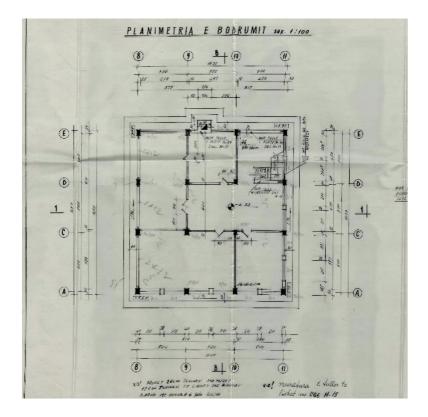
4. Plan of the underground floor. Taken from the Museum's Archive.
